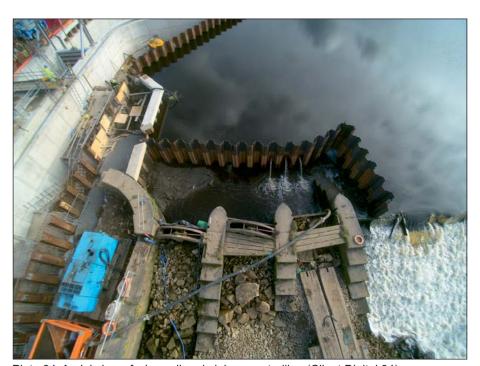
Aerial view of wingwall and sluices post-piling (Client Digital 34)
